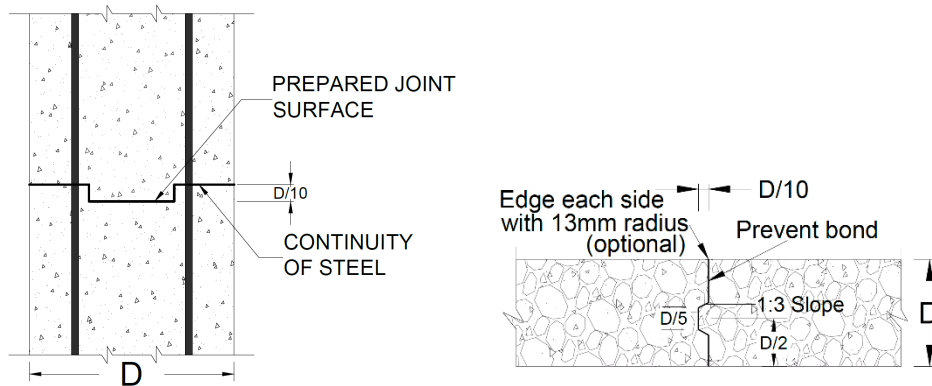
Schematic diagram of a construction joint (IS 3370 Part I)
